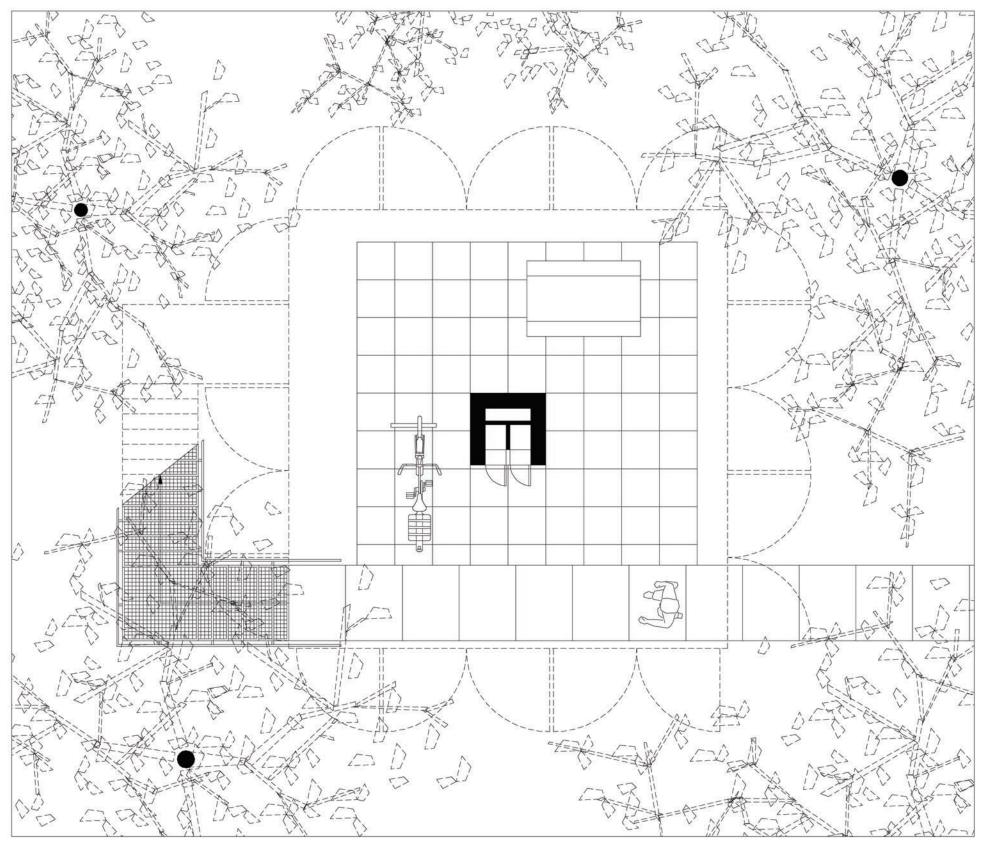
Backyard Infill - Tree House Second Floor Plan
